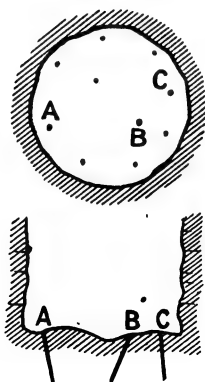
Position of Sumping-Holes at Bottom of a Shaft.
